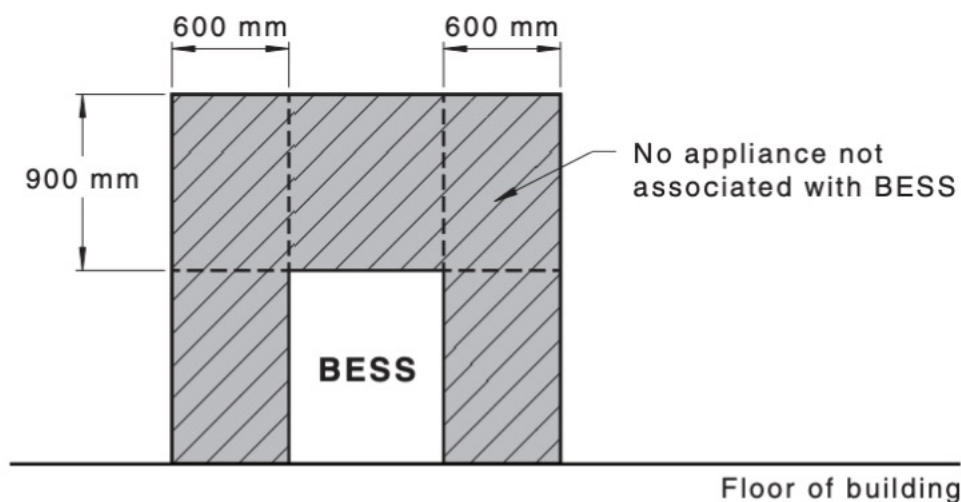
Suggested dimensions and barrier zones for pre-assembled integrated BESS installed on or near a habitable room facing wall.
